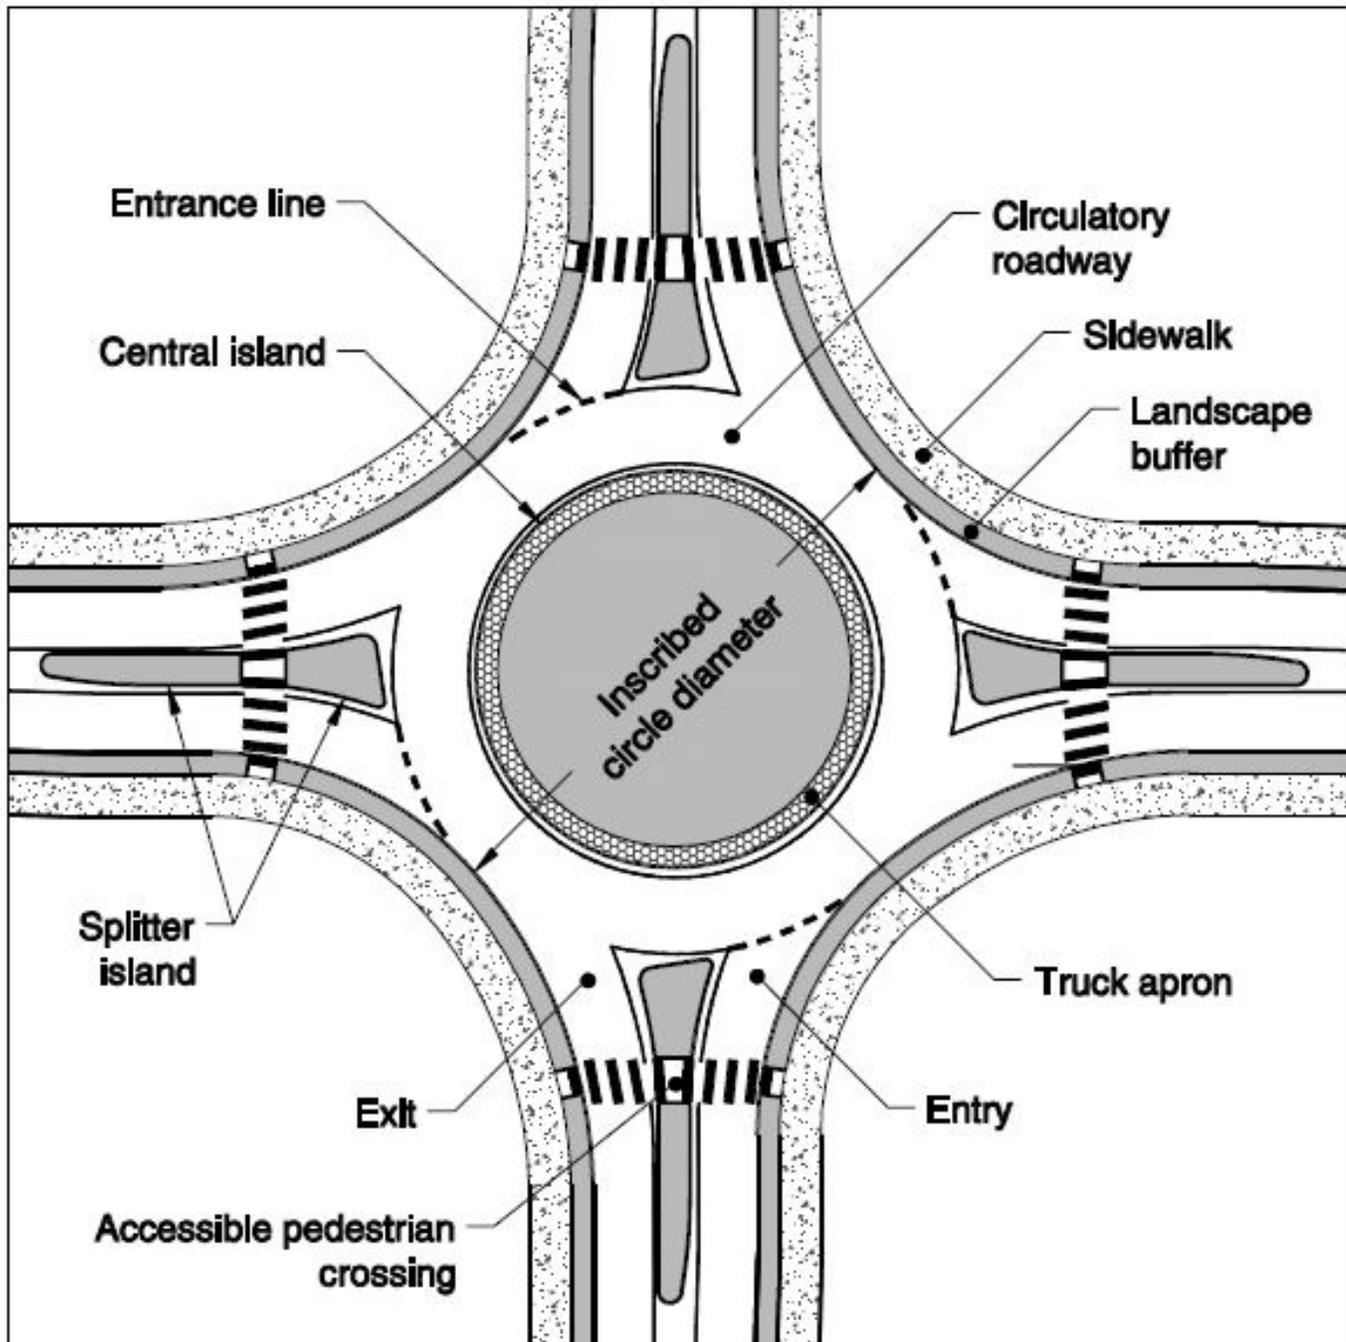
ROUNDABOUT DESIGN ELEMENTS
